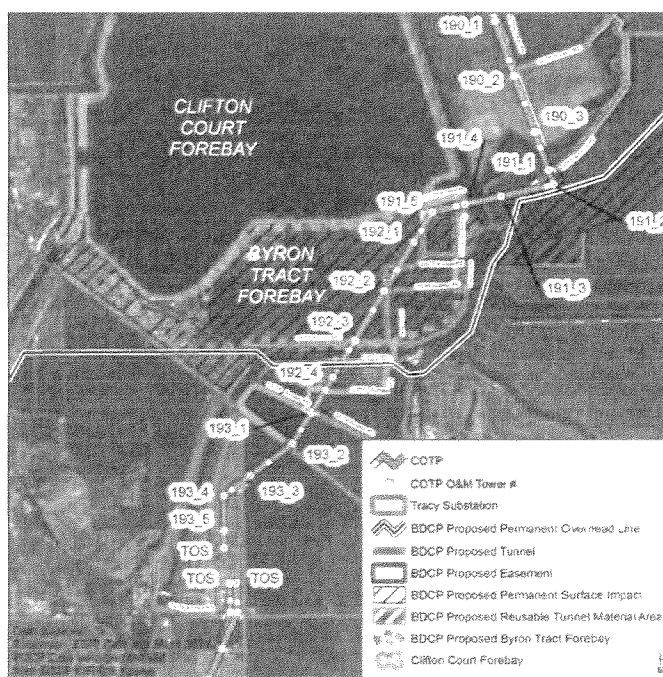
Byron Tract Forebay Expansion Across the COTP ROW
